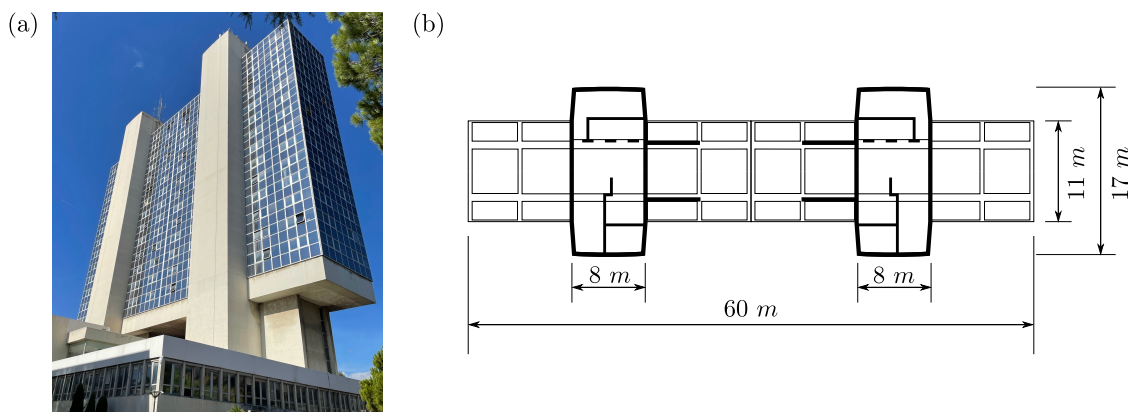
Nice Prefecture: (a) perspective view of the building and (b) horizontal section of building structure
